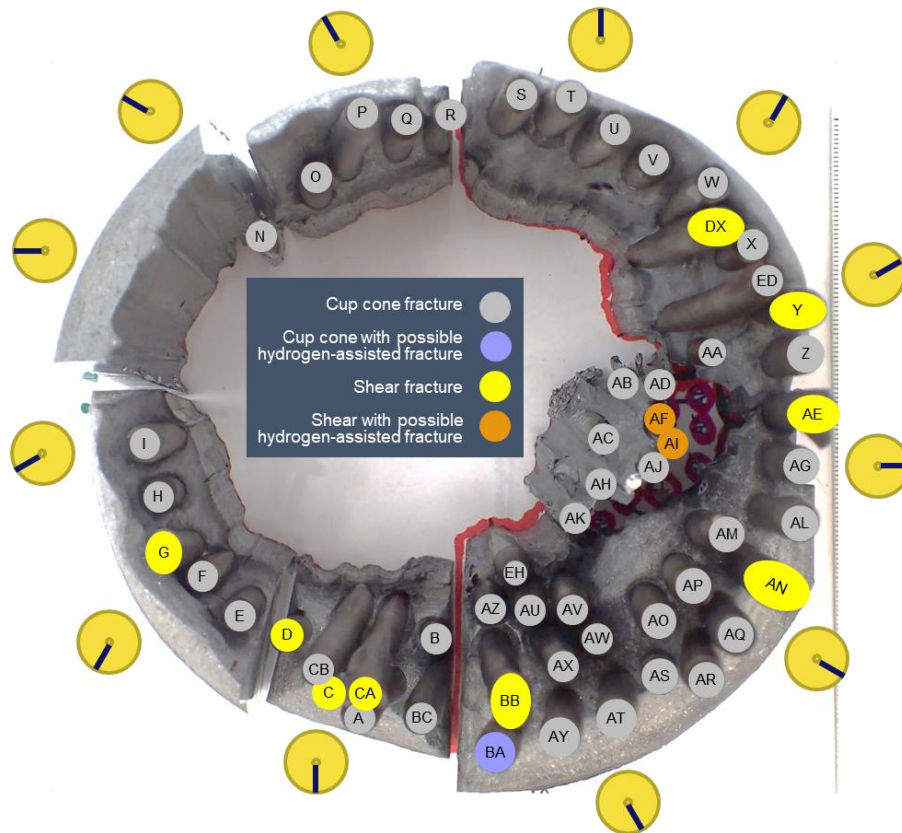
Reconstruction of Wire Locations following Zinc Removal with Identified Fracture Morphology
